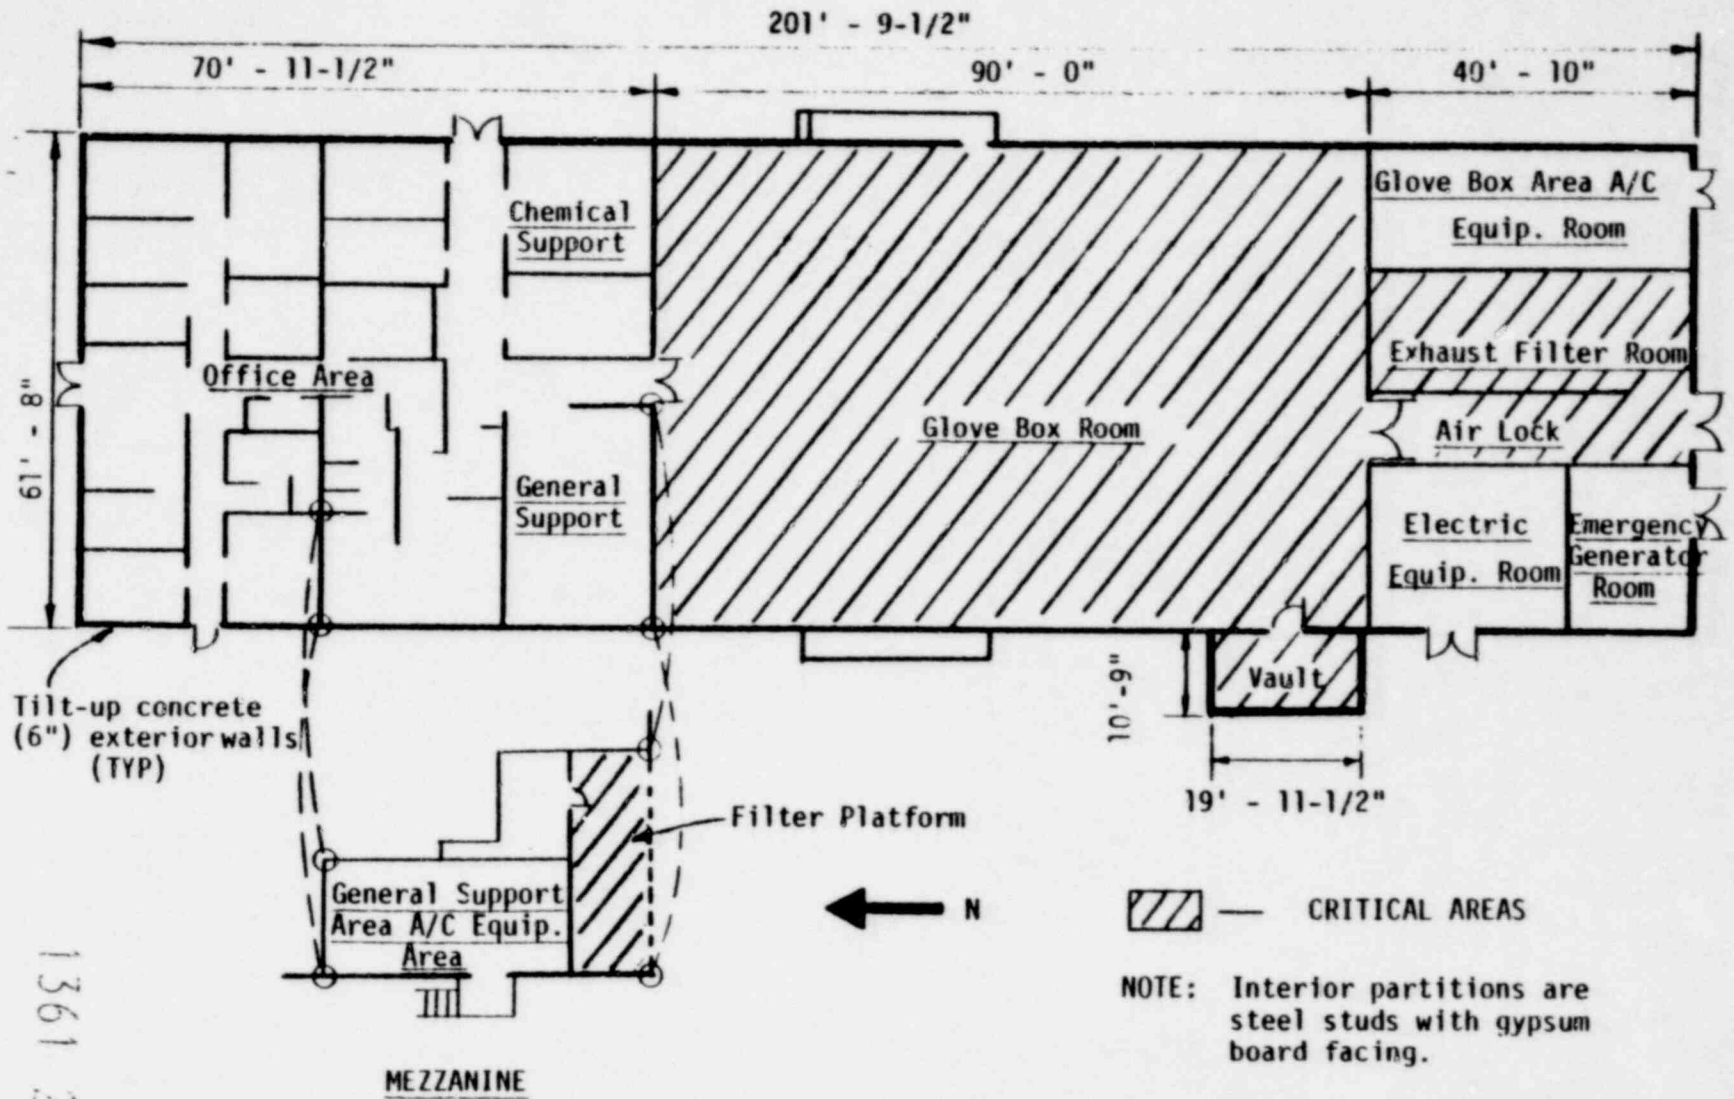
NMDF BUILDING FLOOR PLAN
